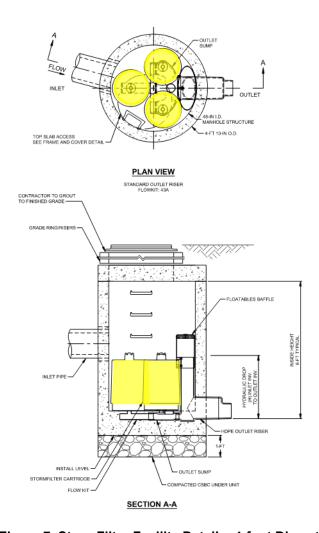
StormFilter Facility Details: 4-foot Diameter Manhole (WQ-1 and WQ-2)
